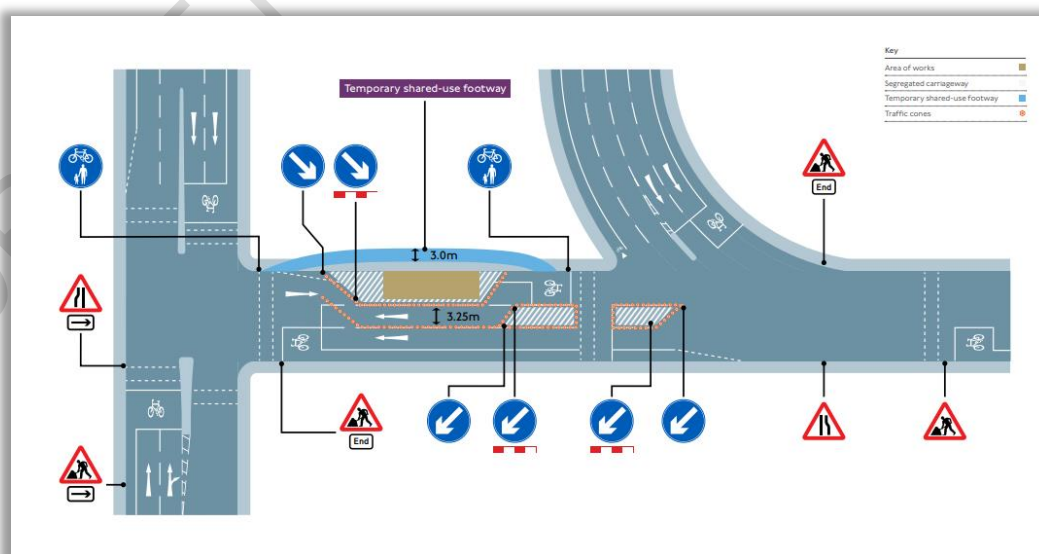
Example Road Layout - Temporary Shared-Use Footway
